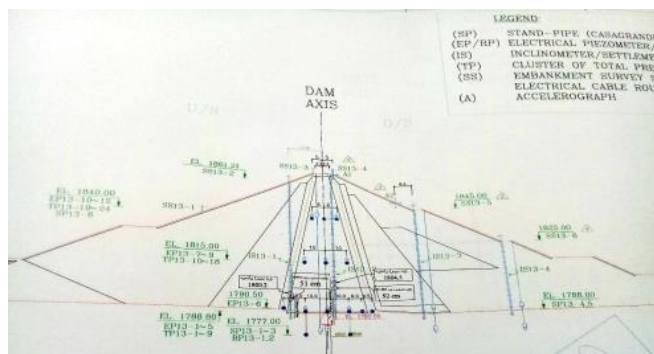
Typical cross-section of Kamal-Saleh rockfill dam [8]
